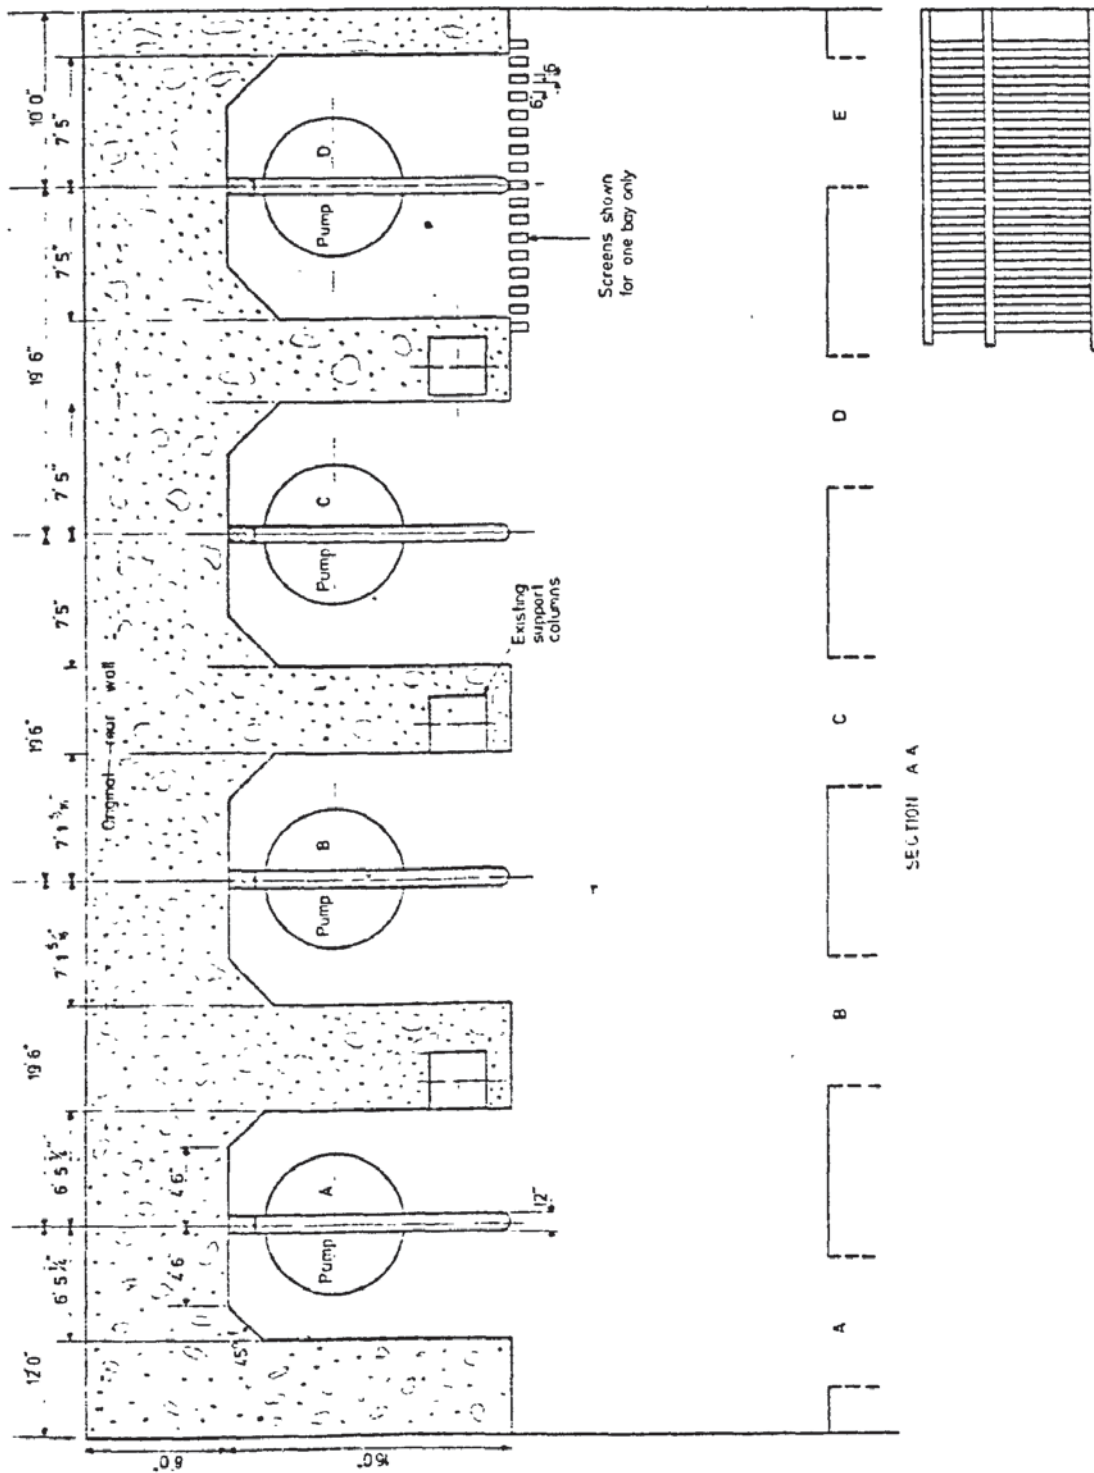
Plan view of final design of No. 1 unit (Horizontal shelf not shown).
